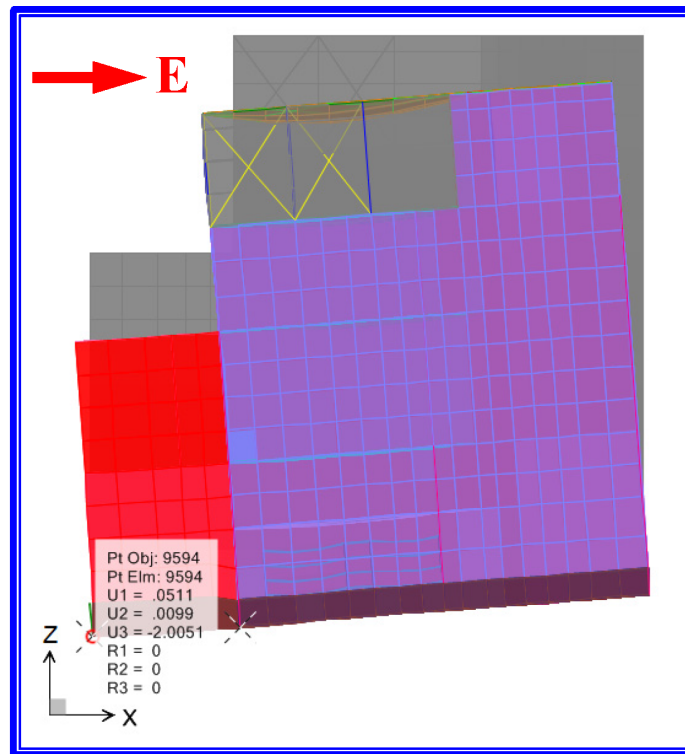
Elevation View (Facing North) of Tilted CRB
